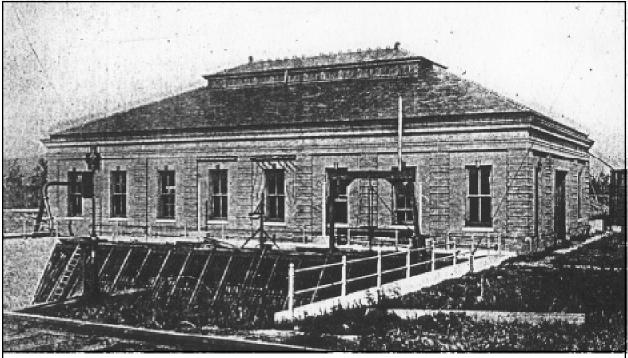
Drainage Pumping Station No. 7 as originally constructed, 1909 (from Sewerage & Water Board, 1909).
